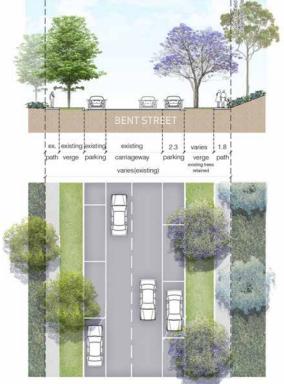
Proposed DCP Figure 12.11 - Bent Street
